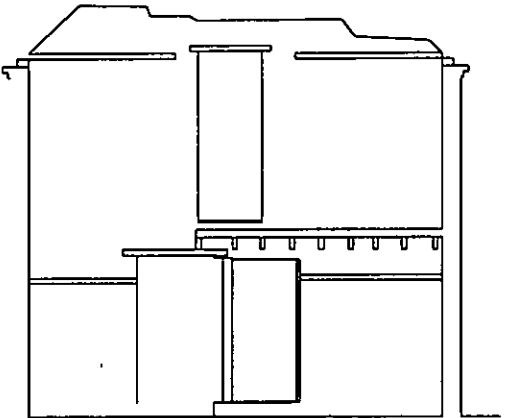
An interior elevation of the east wall of the principal range based on survey notes made on 1/10/96
